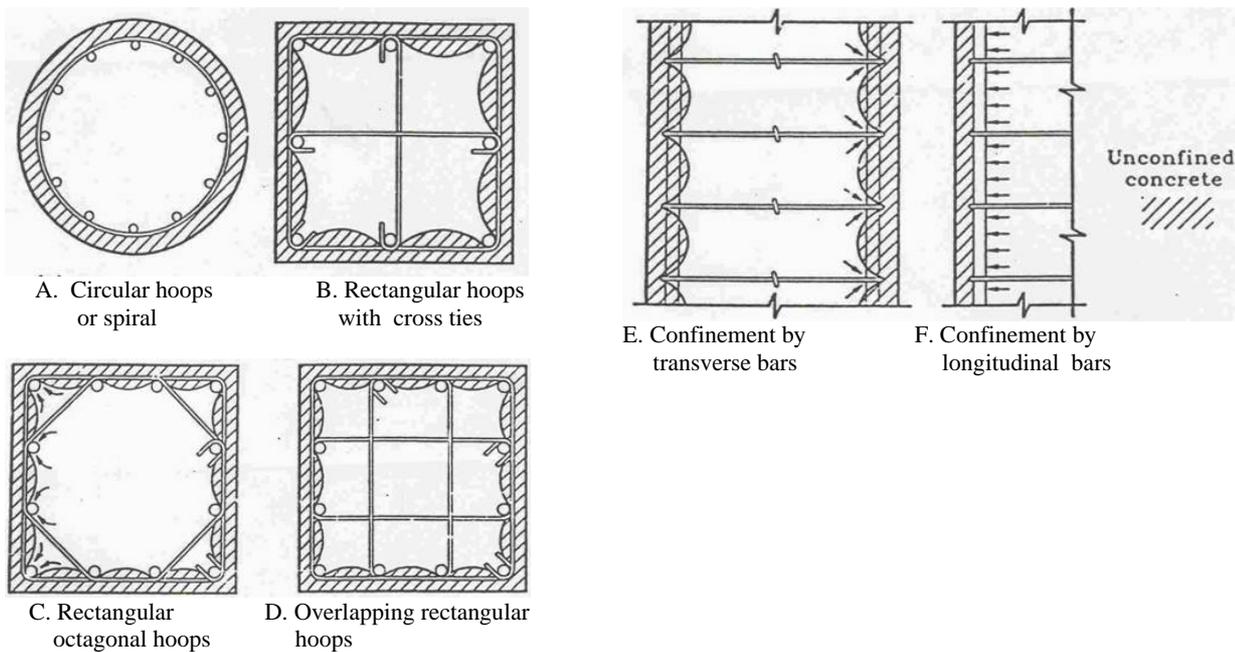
Confinement of column sections by transverse and longitudinal reinforcement (after Priestley et al. (1996))
